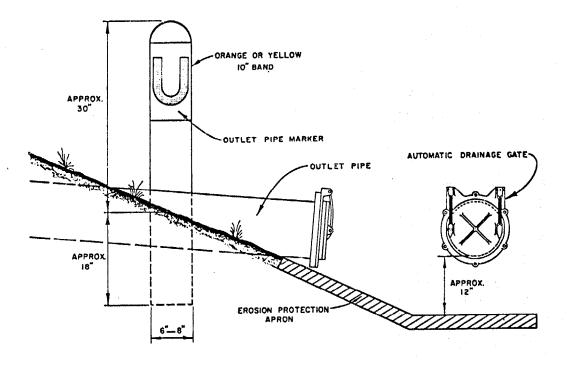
Recommended Detail for Outlet Pipe and Marker (16)
